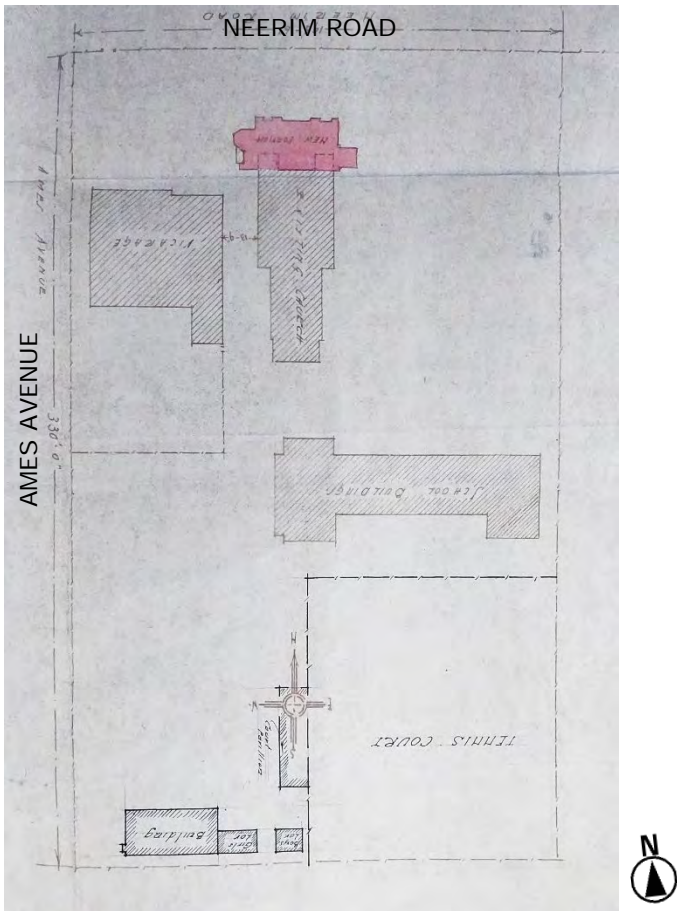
Site plan, c1925. Coloured red is the narthex to the existing timber church. The plan also shows the earlier vicarage to the west, the early extent of the school building to the immediate south, and the tennis pavilion and kindergarten building at the far south end of the site (all of which have been removed) (Source: PROV, PB File)
